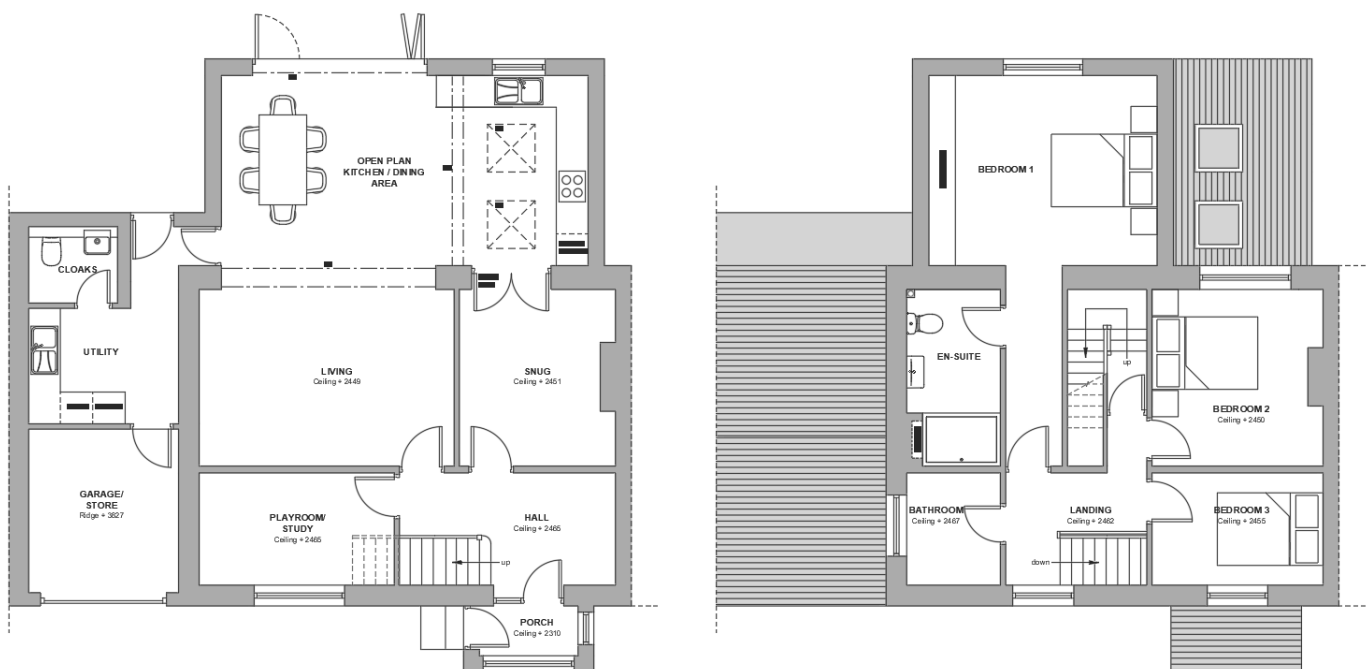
PROPOSED GROUND AND FIRST FLOOR PLANS
